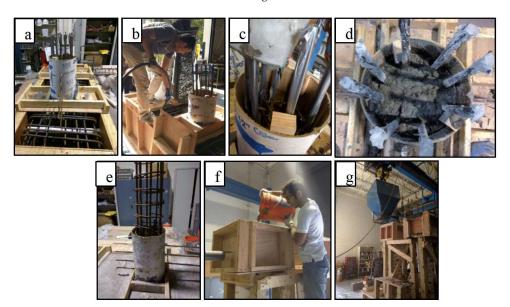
Specimen construction procedures a) Formwork of the support, b) Casting support, c) Casting first layer of UHPC, d) Casting plastic hinge, e) Reinforcement of the column, f) Casting splice region with UHPC and g) Casting column with N.C.
